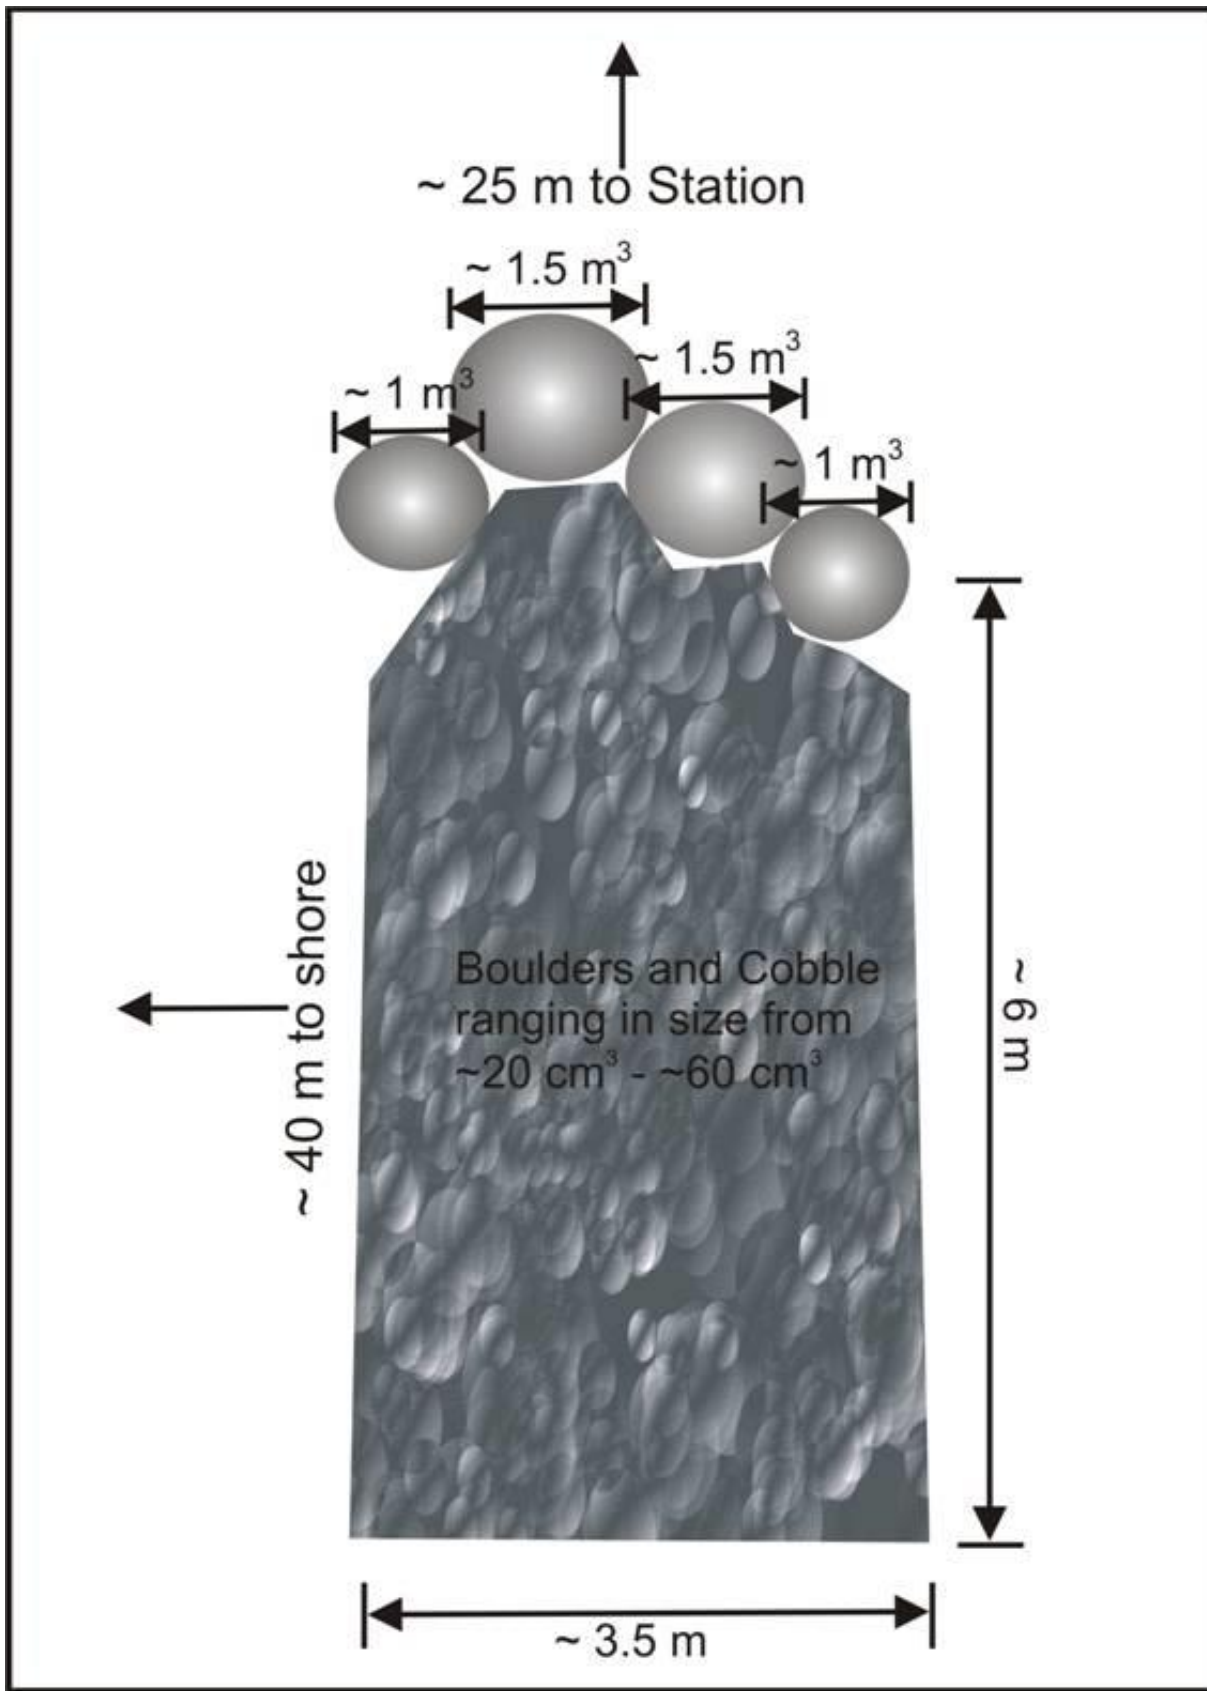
Plan view sketch of shoal constructed below Unit 16 (not to scale).
